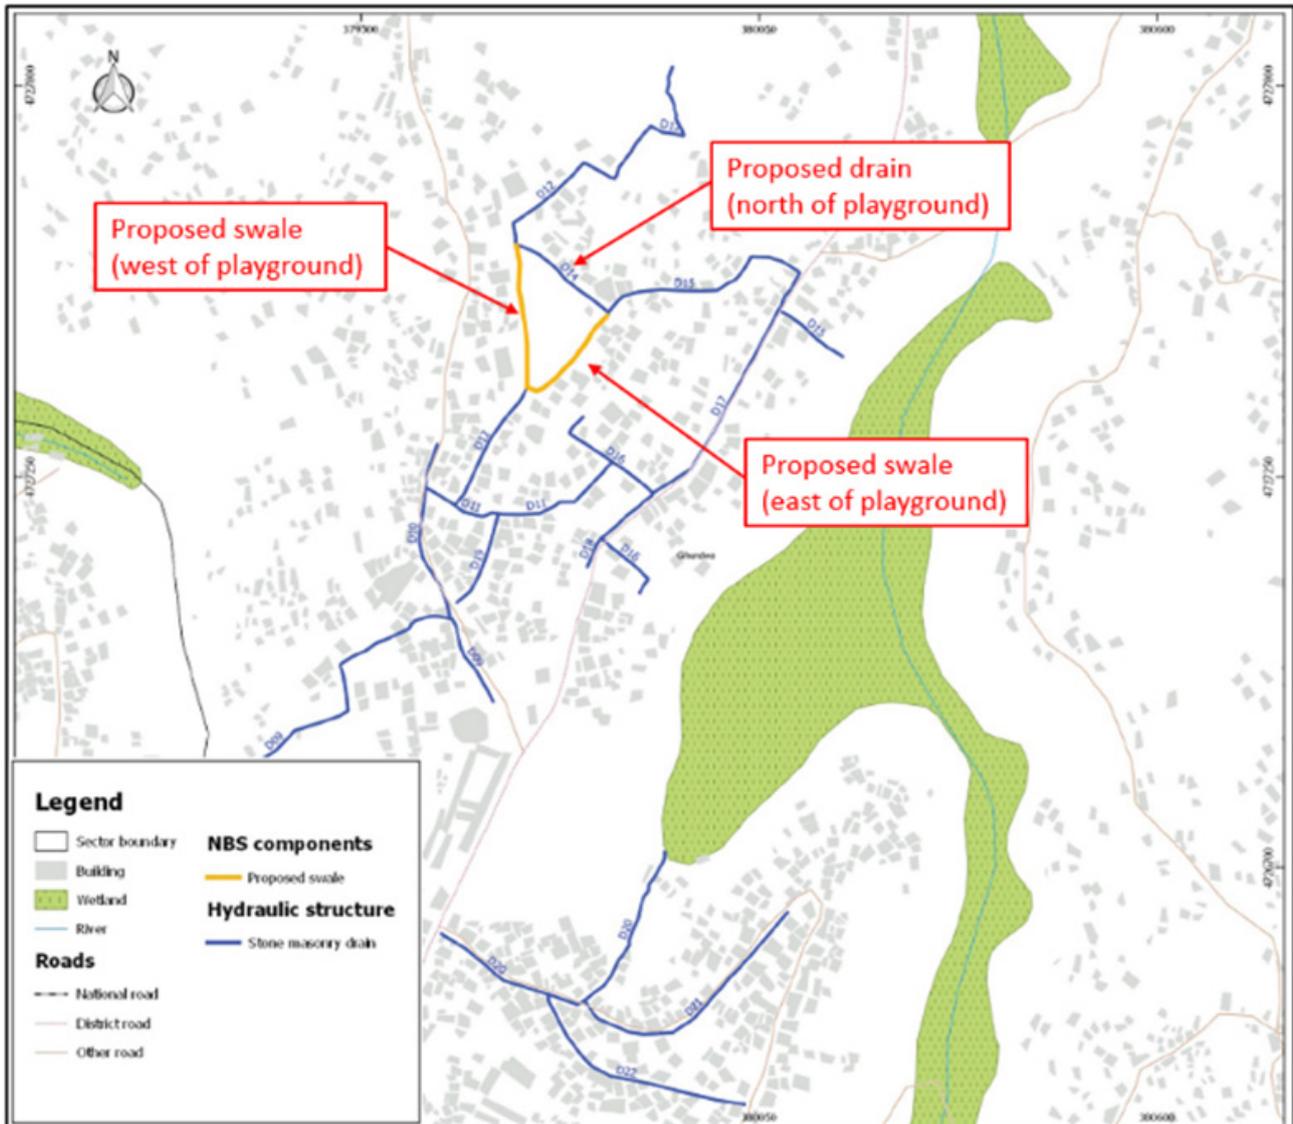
Proposed swales in Gihundwe sub- catchment (Refer to submitted drawings for details)
